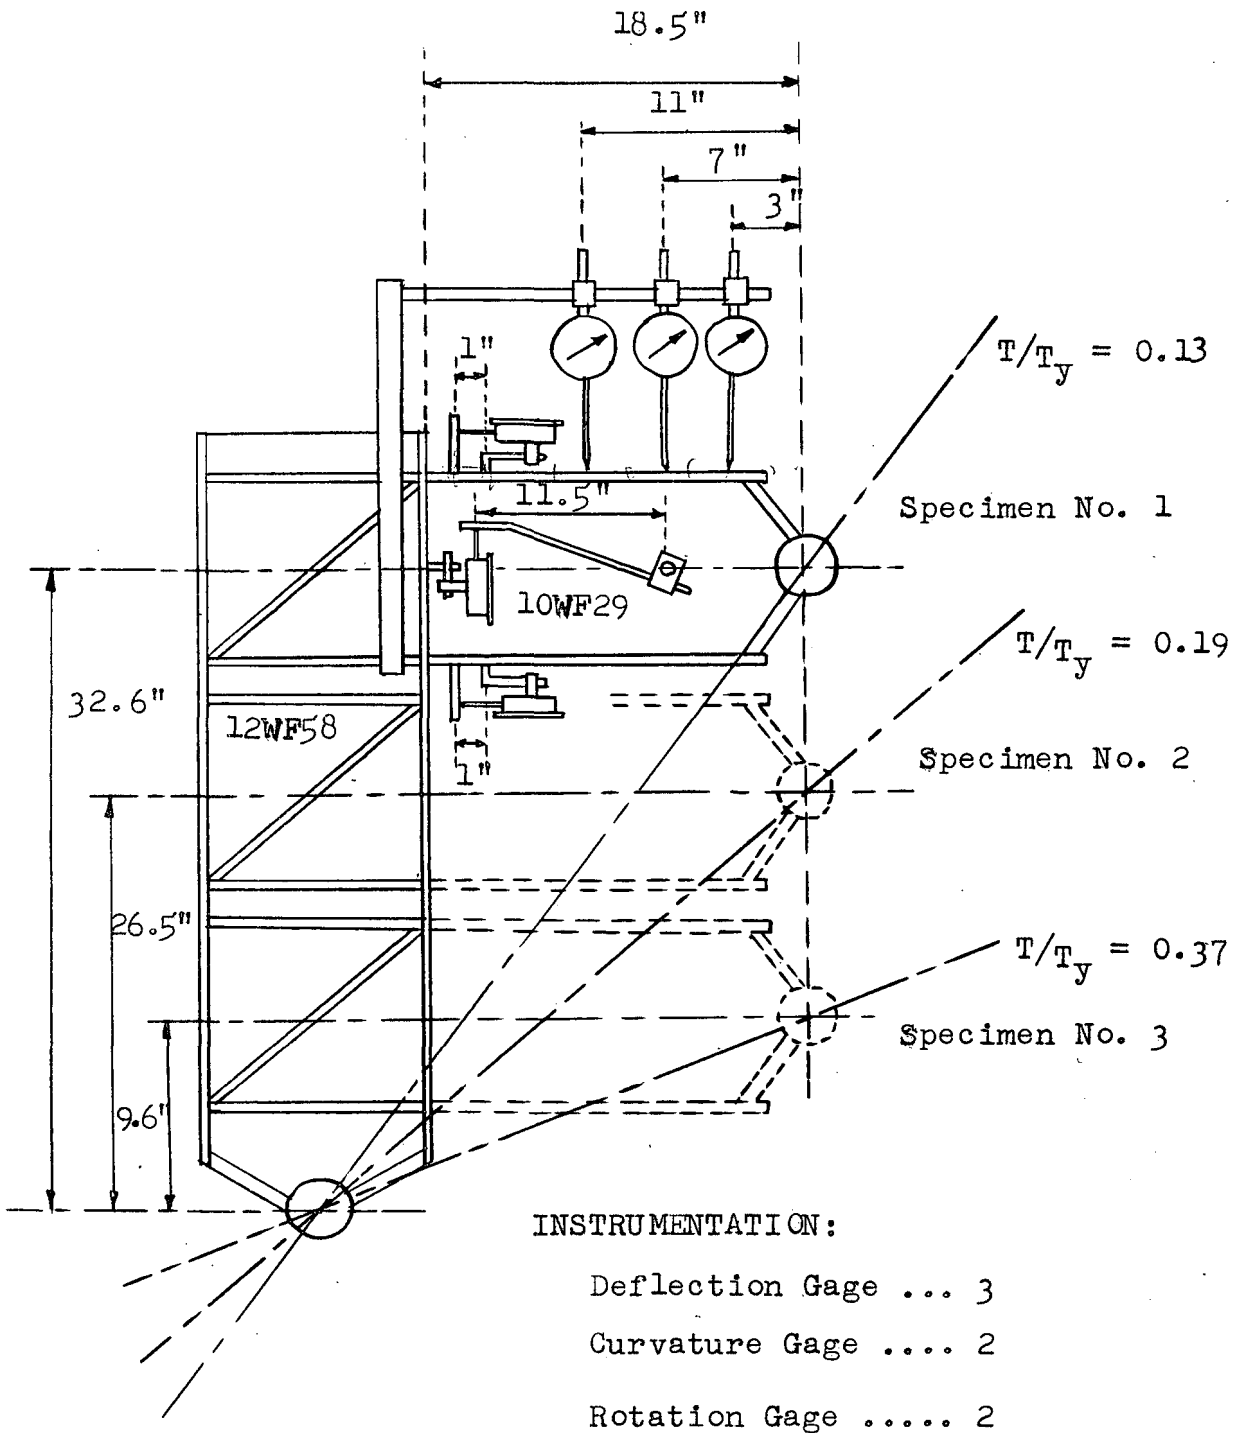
TEST SPECIMENS AND INSTRUMENTATION
